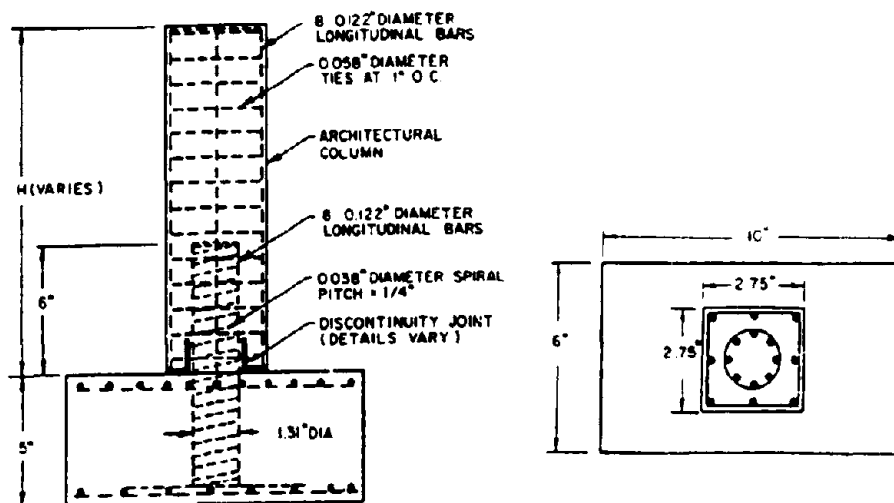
1/20-Scale Specimen Details (after Ref. 22).
